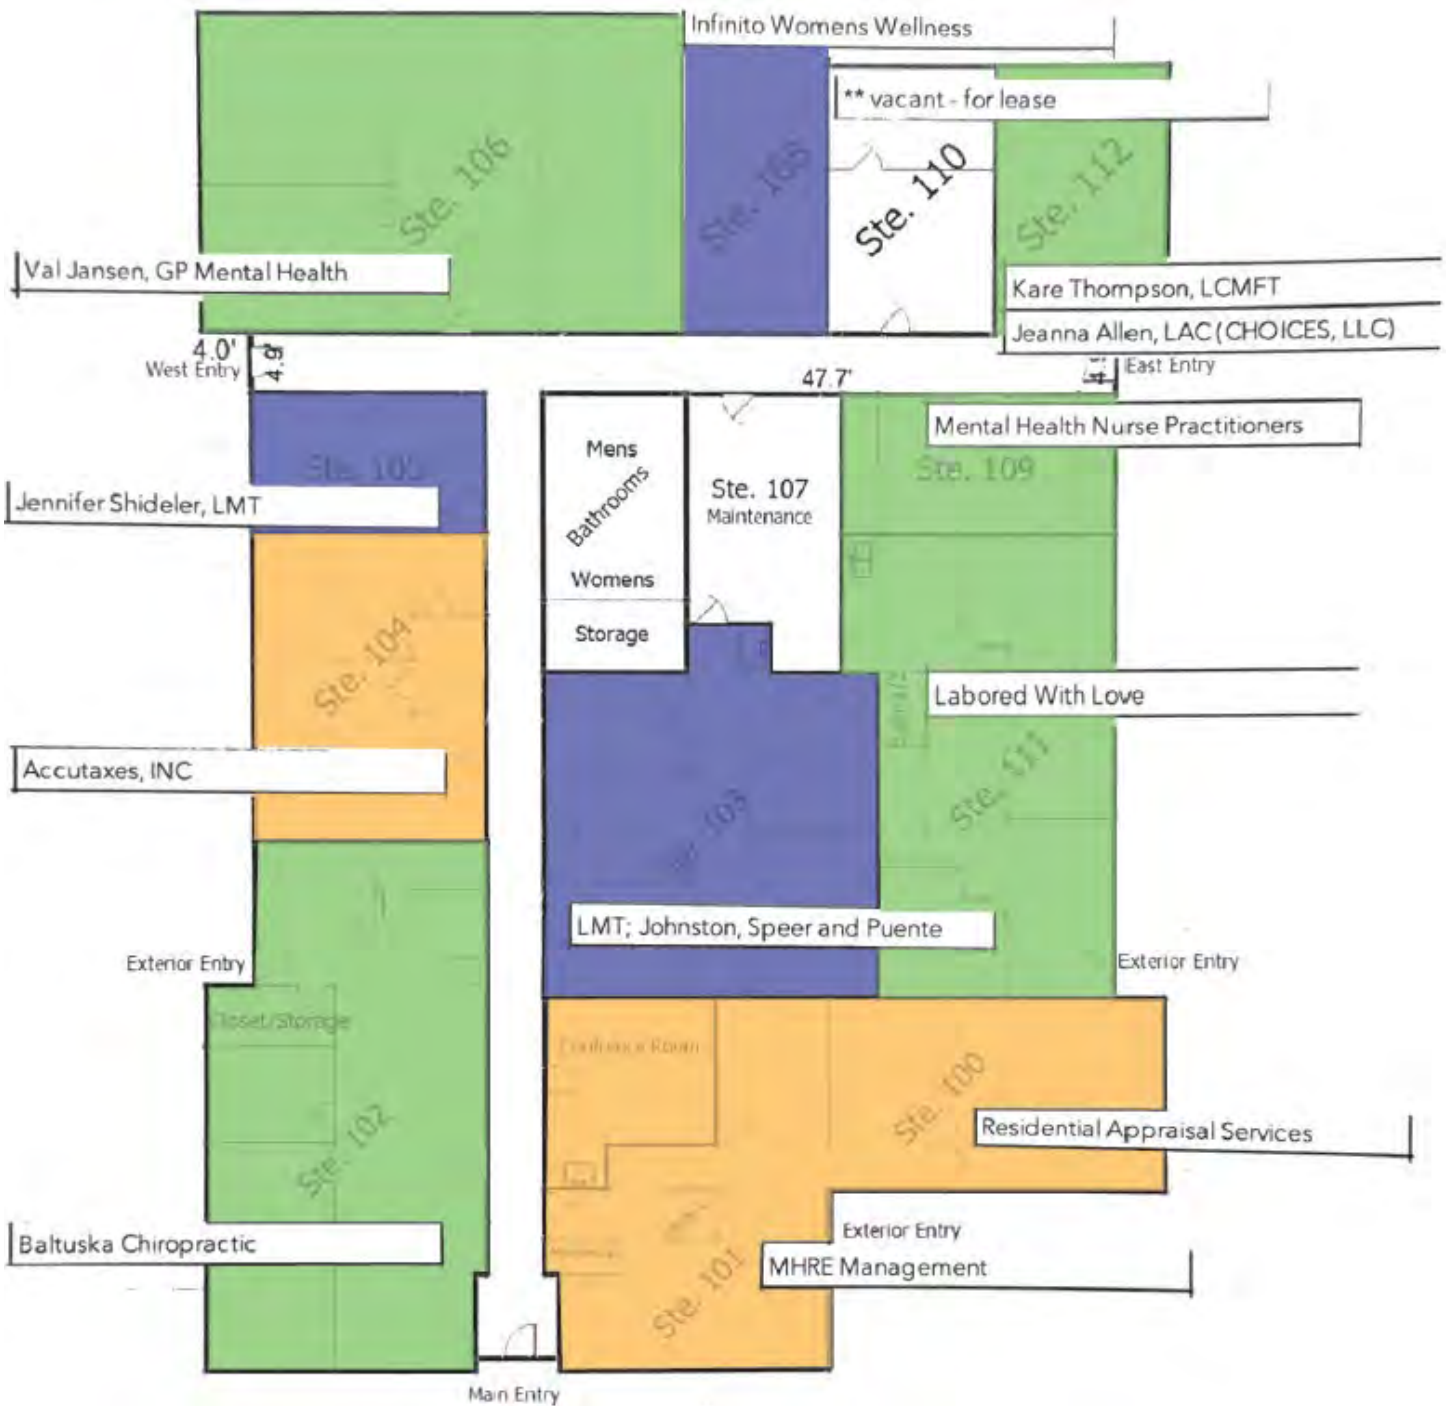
Labeled floor plan of the building, showing current and proposed tenants. Offices are labeled in orange, Medical Clinics are shown in green, and Personal Services are shown in blue.
